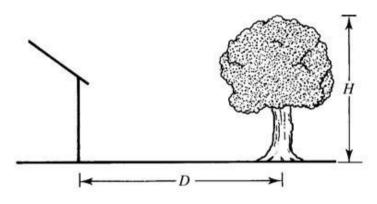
Danger of planting trees too close to a building erected on conventional foundations.
